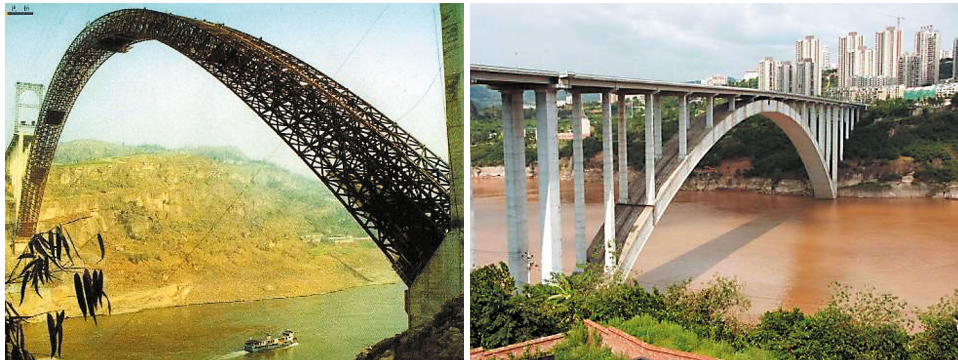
Wanxian Bridge – China, 420 m span, built in 1997.
